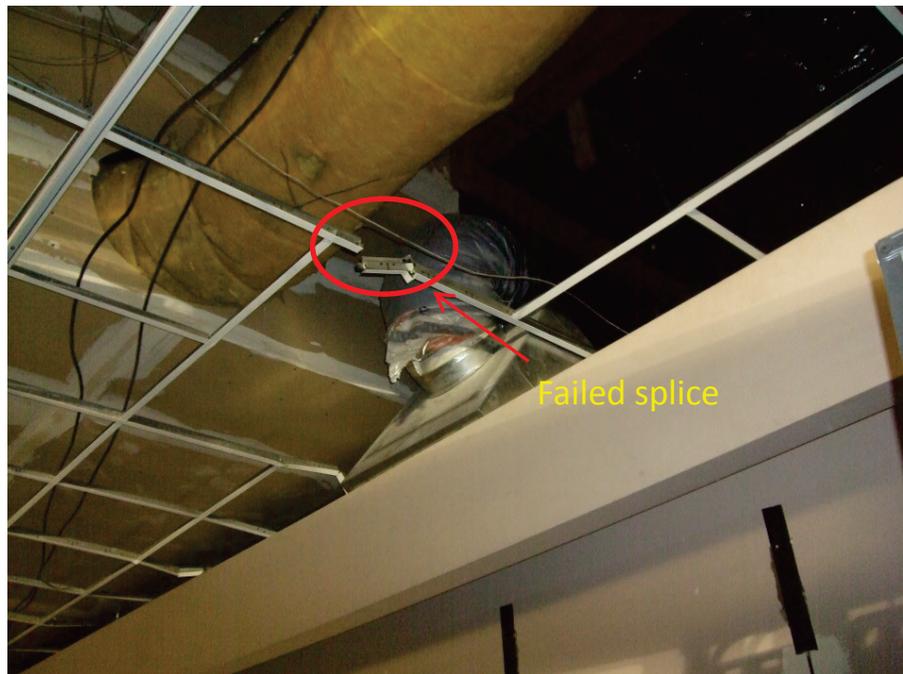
Failure of a splice of acoustical tile ceiling grid in a two-story retail store in downtown Napa.
